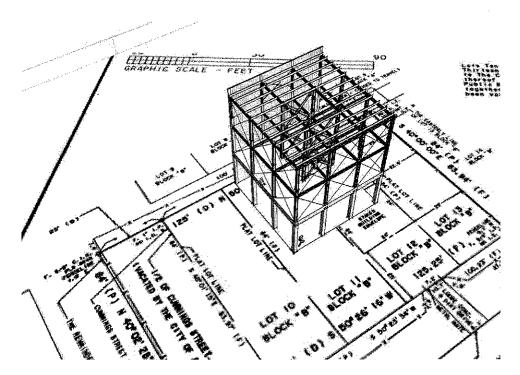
The placement of building on the survey. (Reproduced with permission from Building SIMPLE: Building an Information Model, 2006)
